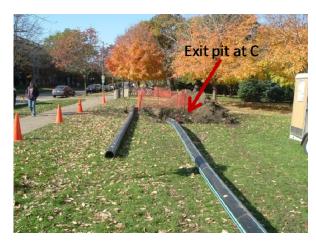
HDPE pipe being pulled from exit pit at point C to launching pit at point A
